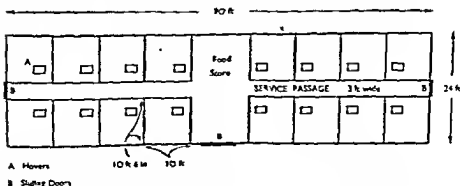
PLAN OF A BROODER HOUSE FOR FLOOR BROODING
